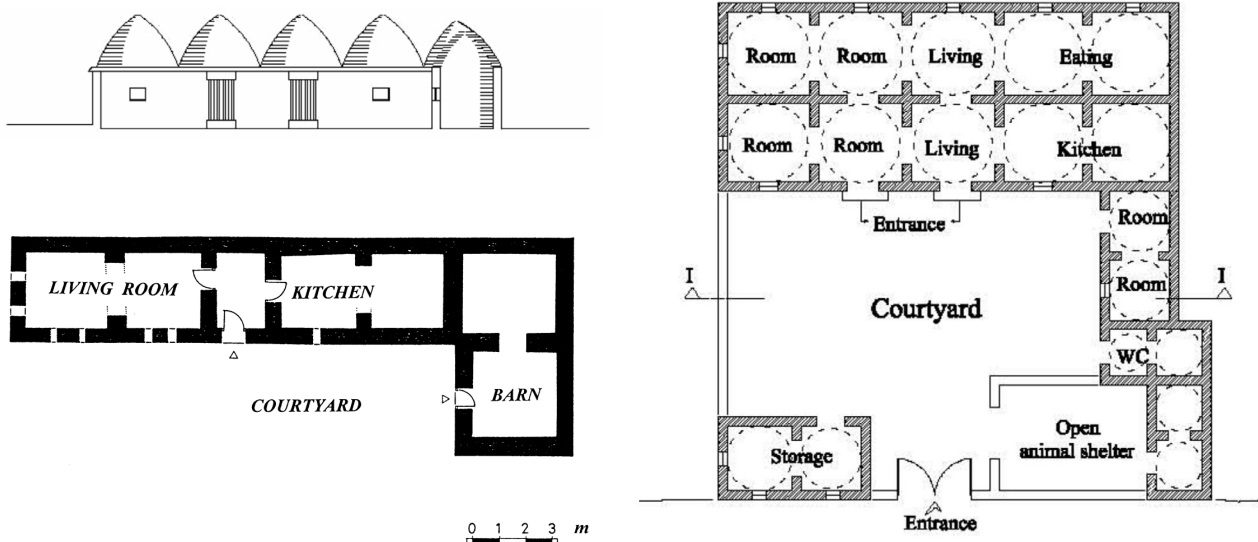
Plans and sections of a typical Harran house (taken from Özdeniz et al., 1998; Sami & Özdemir, 2011)
